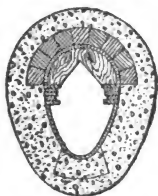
Sewer, $2\frac{1}{2}$ feet by 1 foot 8 inches.
